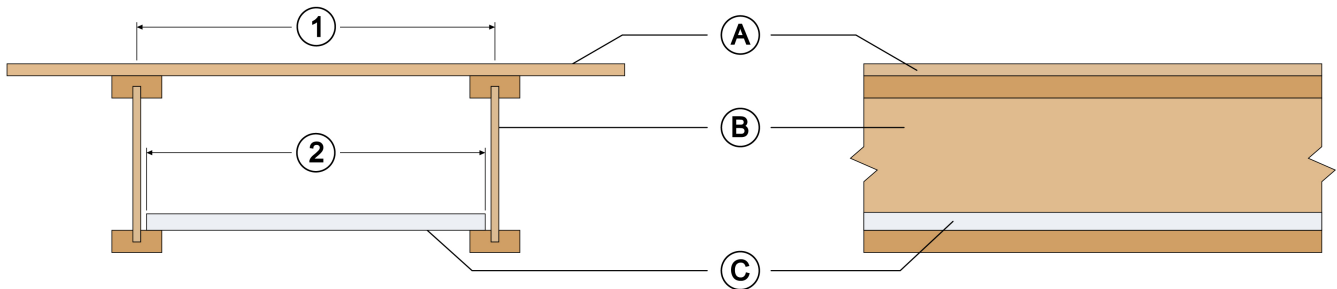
Fire protection of floors FP-07 - fire protection: 15.8 mm (5/8-inch) gypsum board installed on top of the bottom flange
